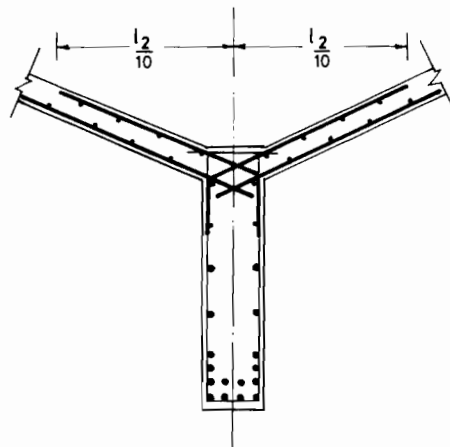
Reinforcement of shell barrels above intermediate edge beam.
